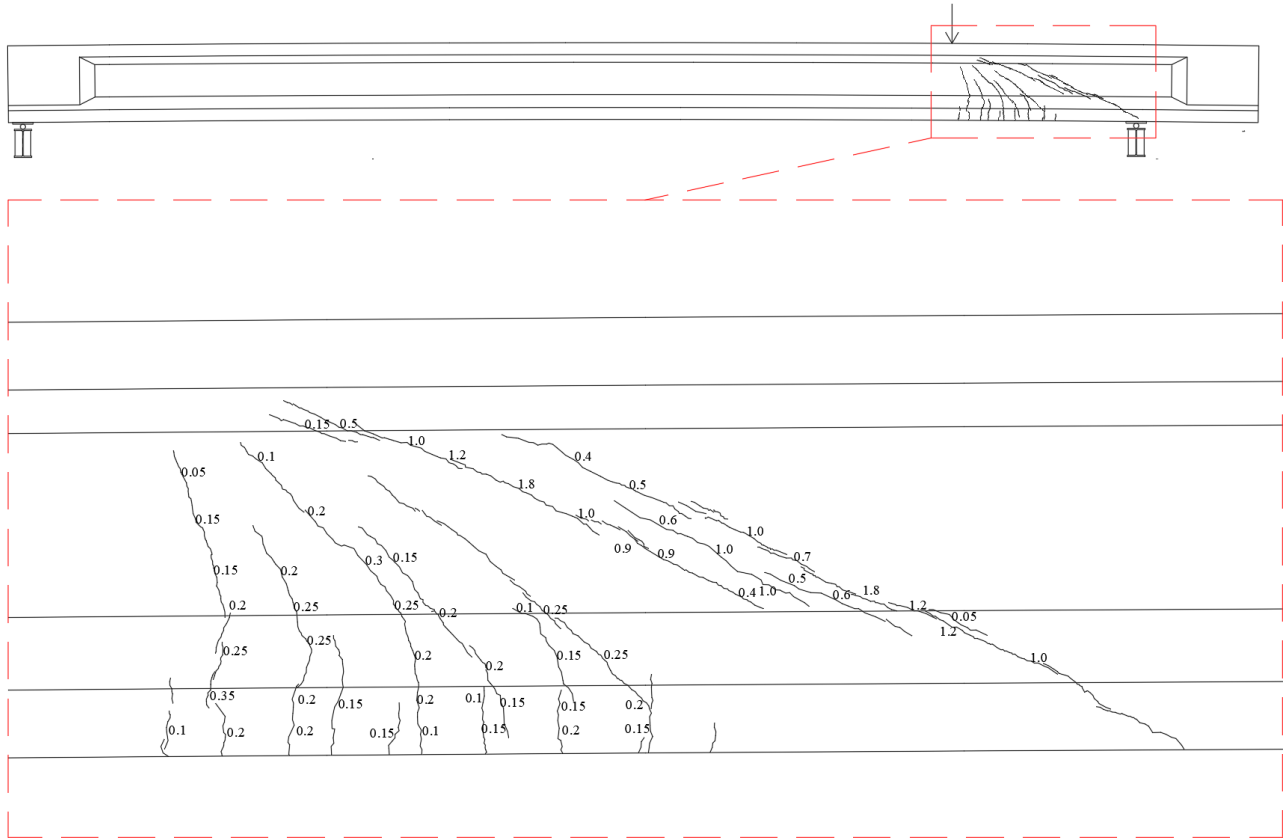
BTE3 North Final Load Stage Crack Diagram (crack widths are in mm)
